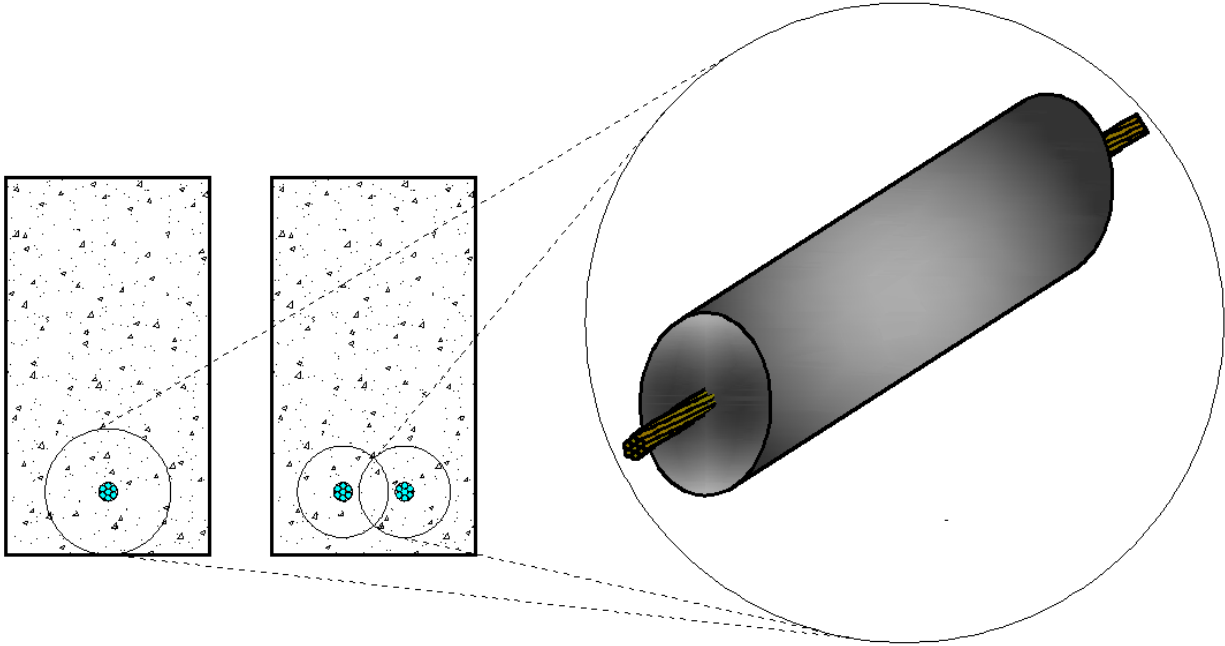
Prestressed concrete beams idealized as thick-walled cylinder.
